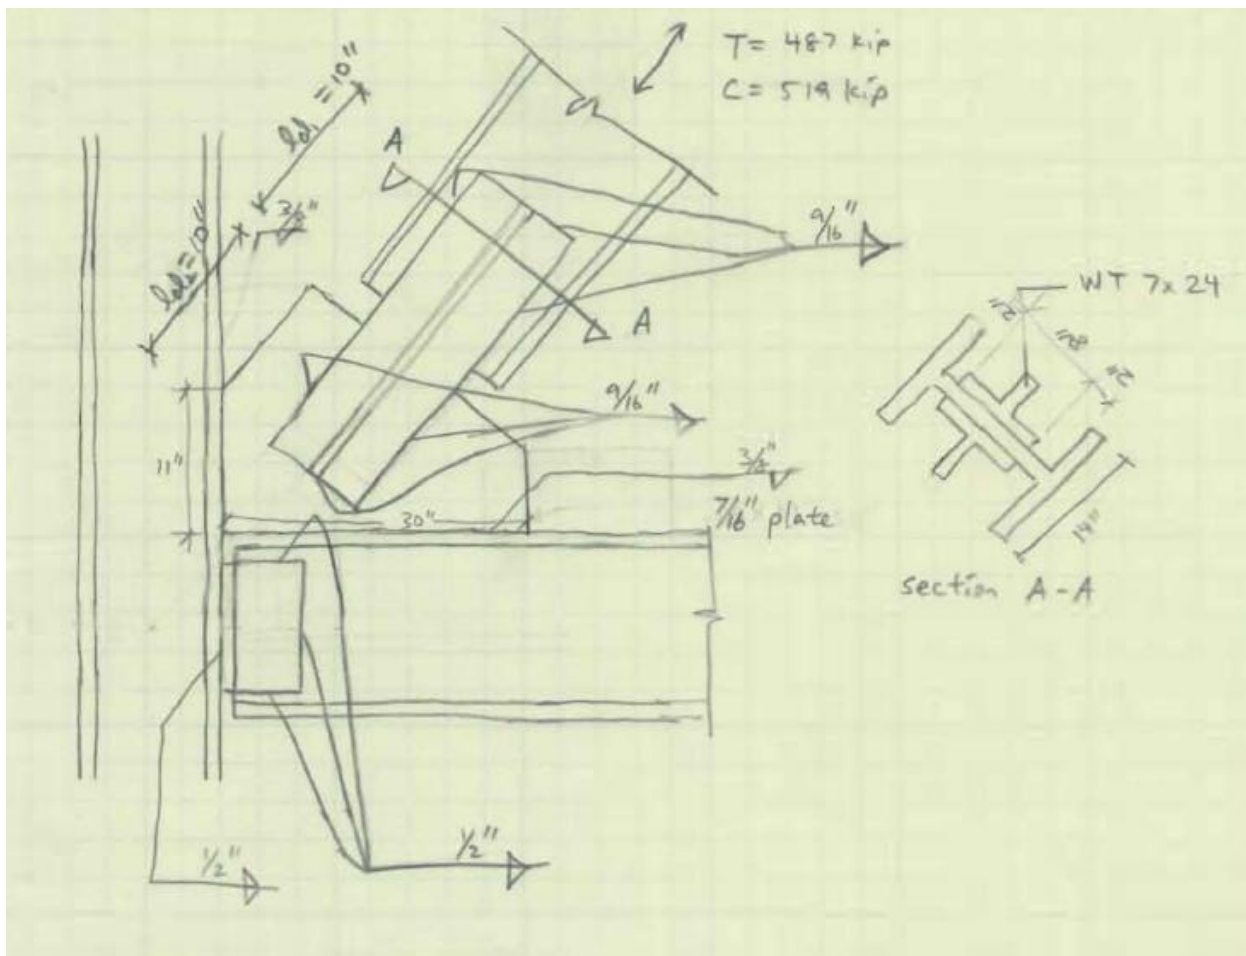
Pin Welded Connection Designed for the Brace on the Second Floor, Frame A. This connection takes up to 636 kip of axial load.
